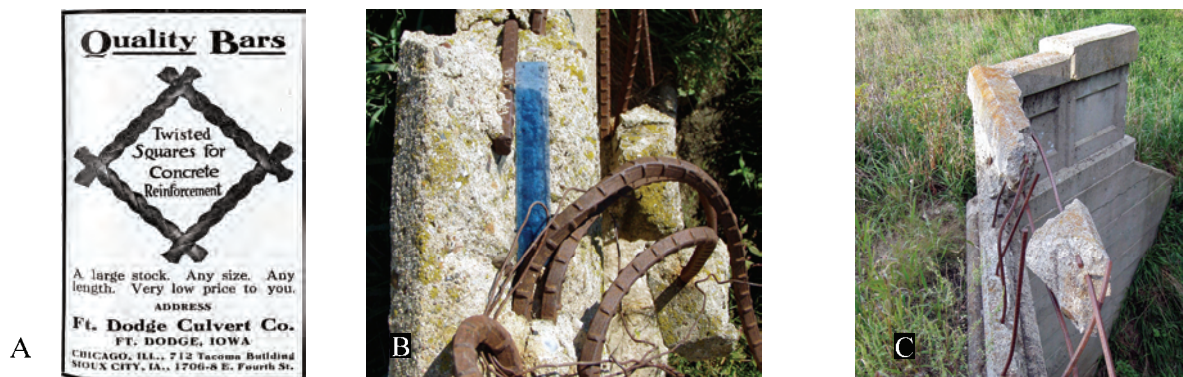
A. Fort Dodge Culvert Company advertisement showing twisted rebar (*Road-Maker* 1912: back cover). B. Woodward County, ca. 1913 culvert with fence wire and early, square, corrugated rebar (6" ruler). C. Square and round rebar in Cherokee County ISHC plan culvert (2003 survey photos).
